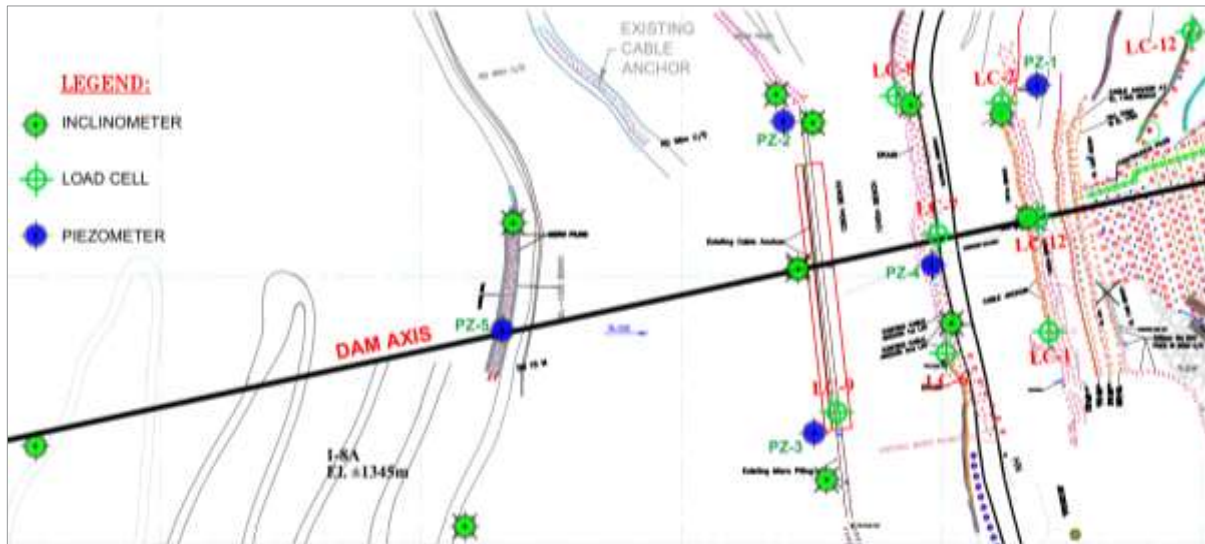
Layout showing the locations of inclinometers and piezometers installed on Dam Right Bank Slope.
